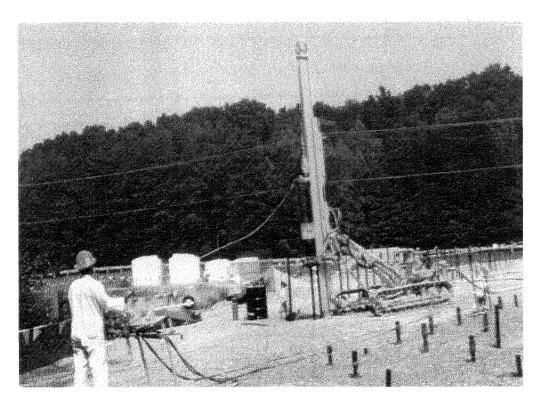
Grouting Trench 1 at the Oak Ridge National Laboratory (ORNL 1997).
